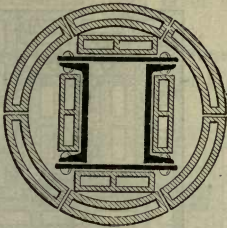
Column Protection, New York Life Building, Chicago. — Jenney & Mundie, Architects.
